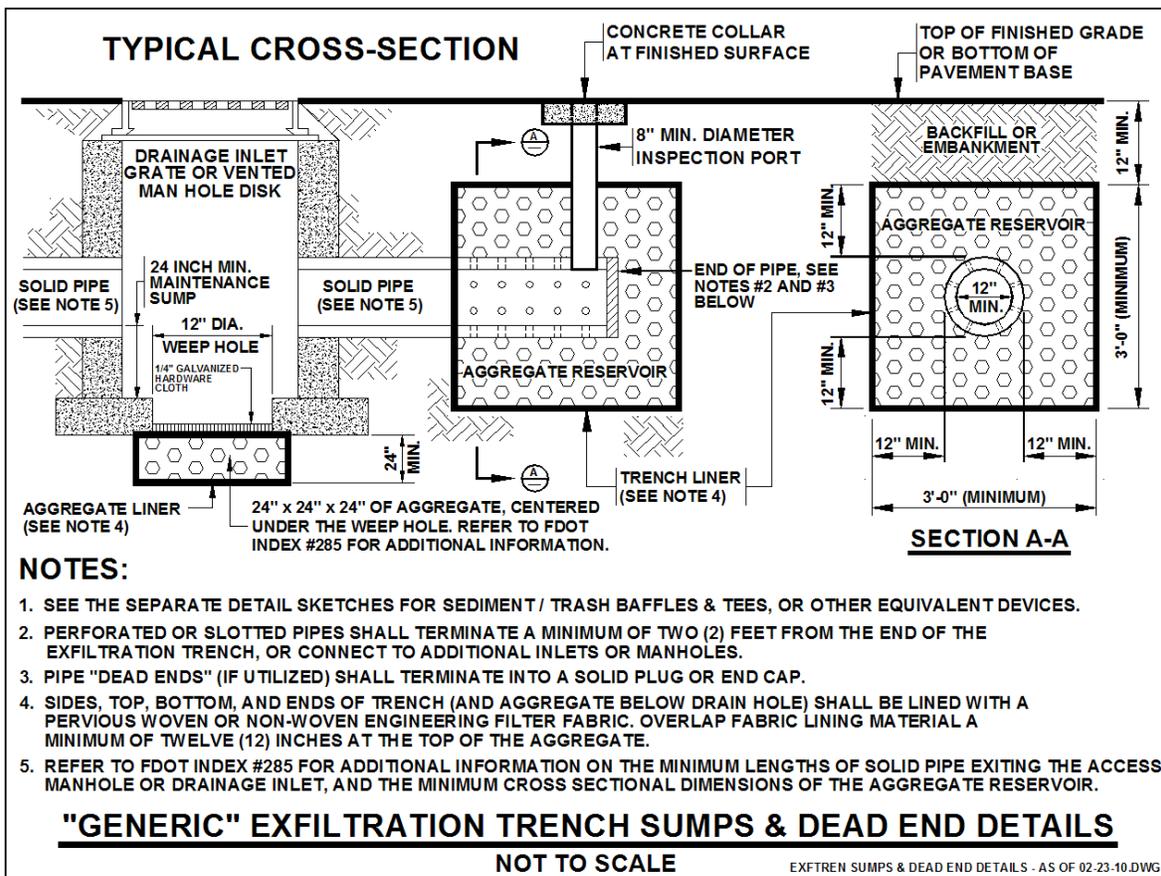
Typical Exfiltration Trench Sumps and Dead End Details
